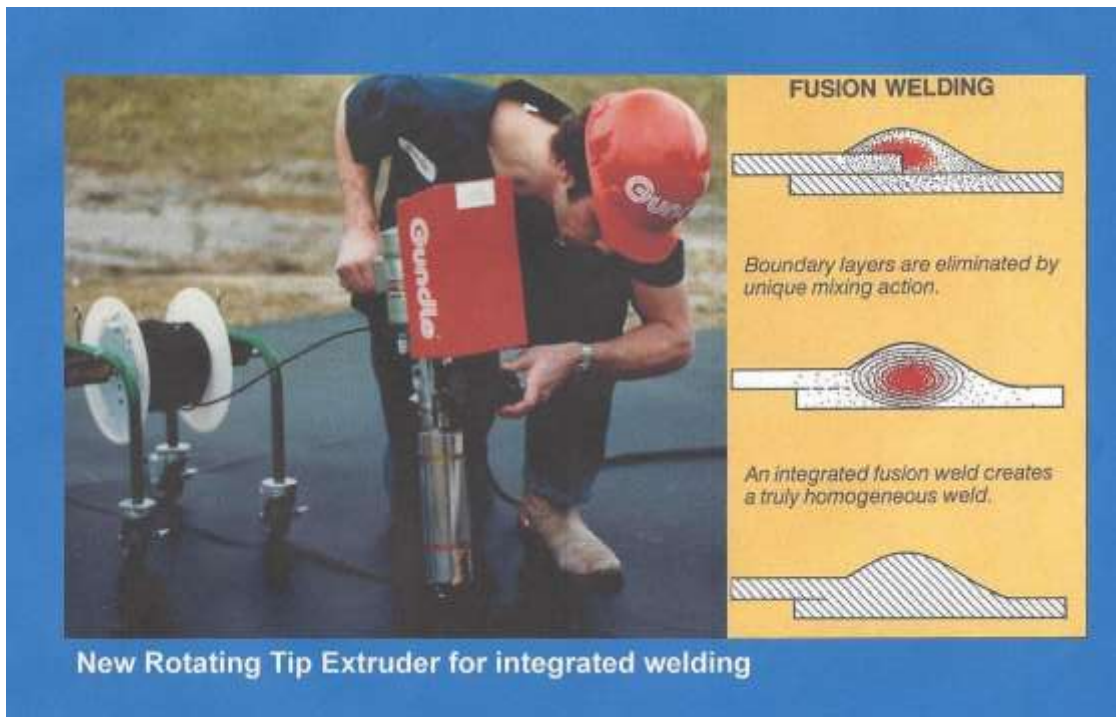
Rotary head extrusion welder (courtesy Clifford Gundle).
